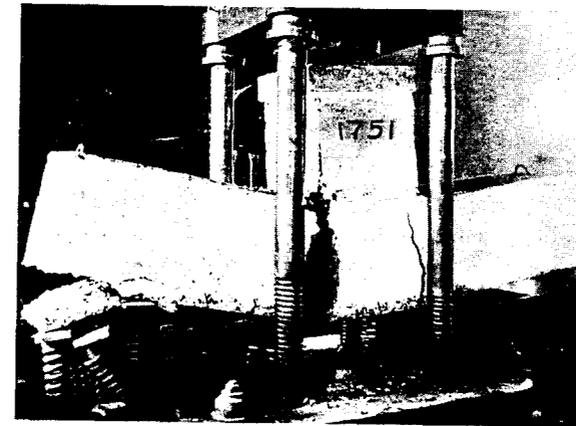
Flexural failure in a spread footing loaded in a laboratory (Talbot, 1913).
